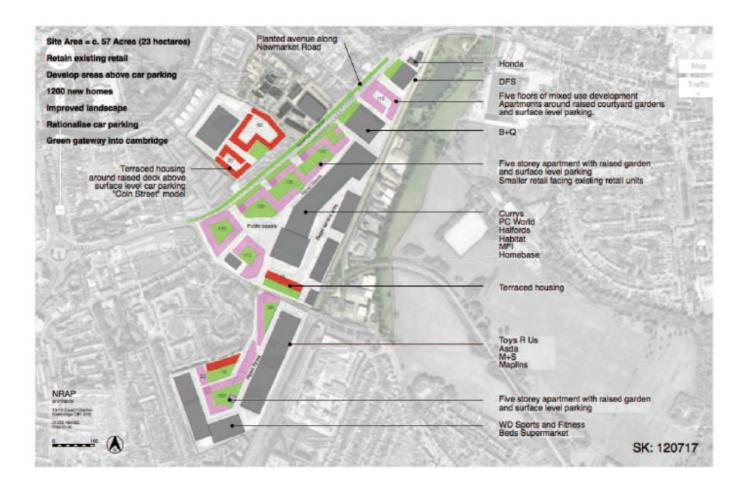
Possible Residential Development of the Car-Parking Land of the Newmarket Road Retail Park and Beehive Centre (by NRAP Architects) Raising the residential units above ground level would also help mitigate the serious ground contamination, especially when combined with the latest remedial technologies. An example of this sort of raised development on a heavily contaminated site is provided by the Coin Street community development at London's South Bank on an old landfill site.
